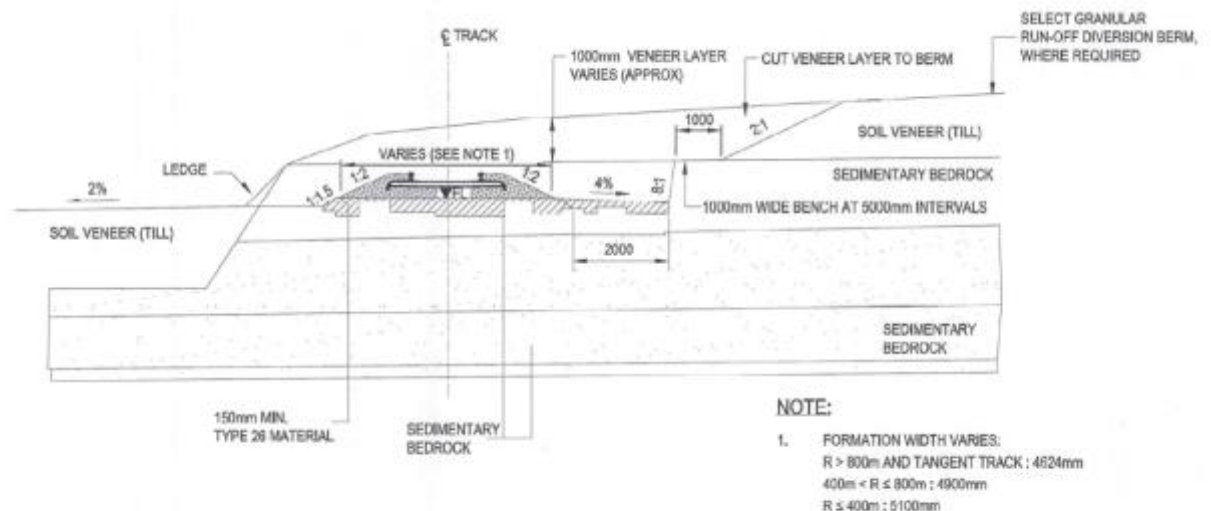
Typical Cross Section of Railway Embankment – Section II
